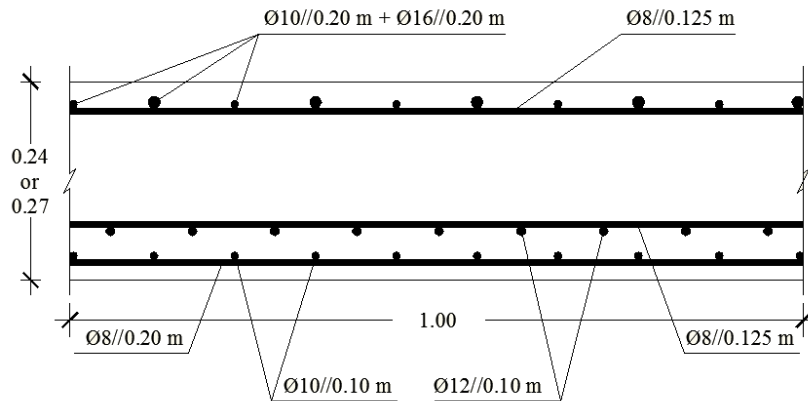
Transverse cross section of the upper deck slab and reinforcement layout
